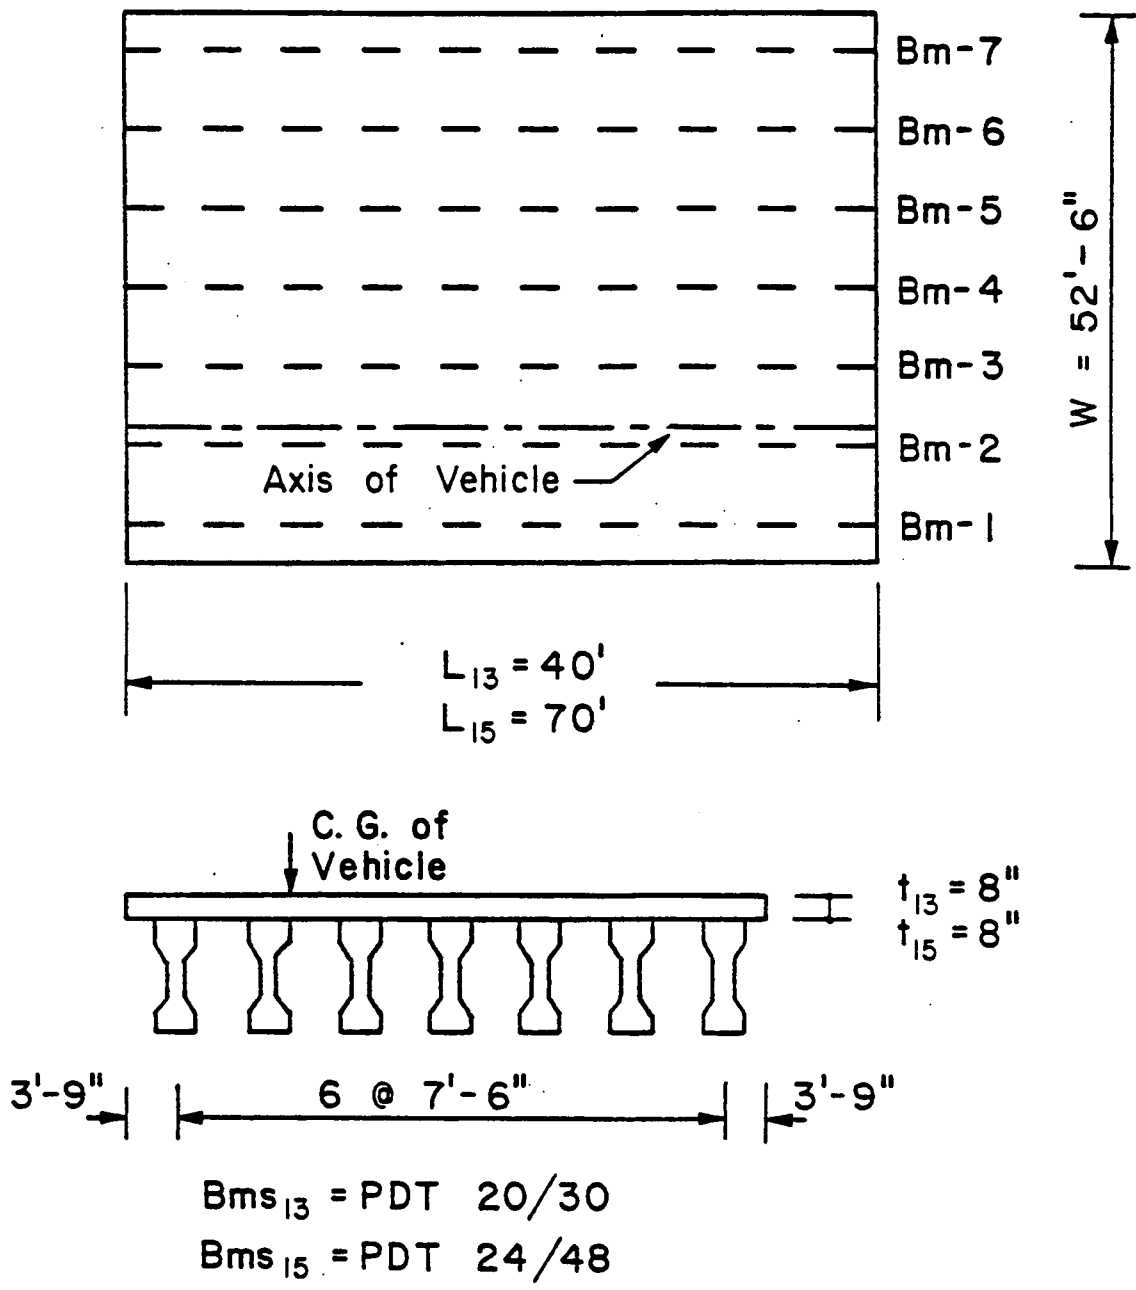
Plan and Cross-Section of Bridges 13 and 15
